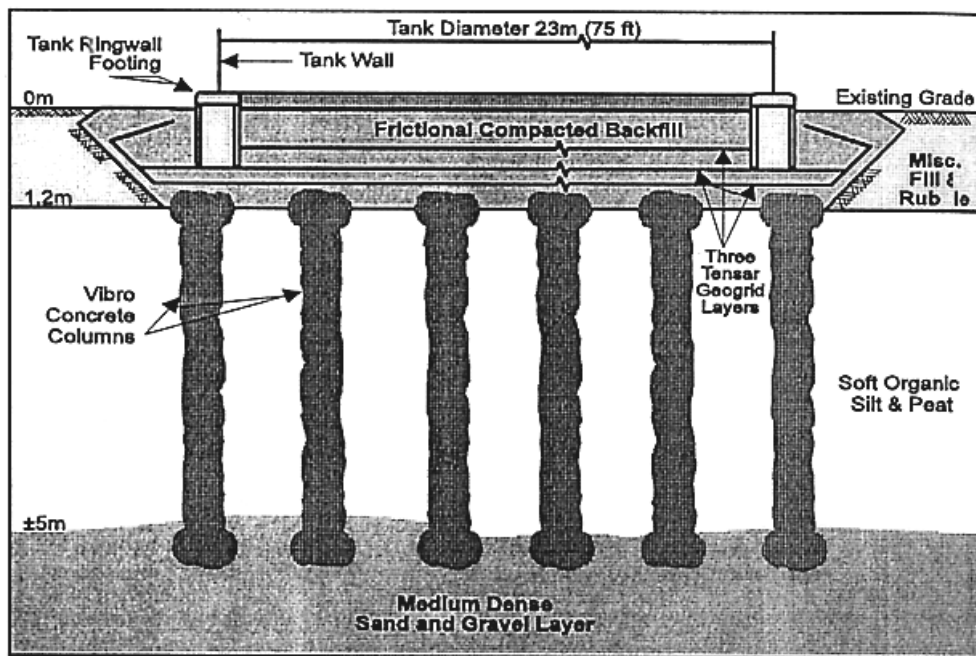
Storage Tank on A Geogrid-Reinforced and VCC-Supported Foundation (Shaefer et al., 1997)
